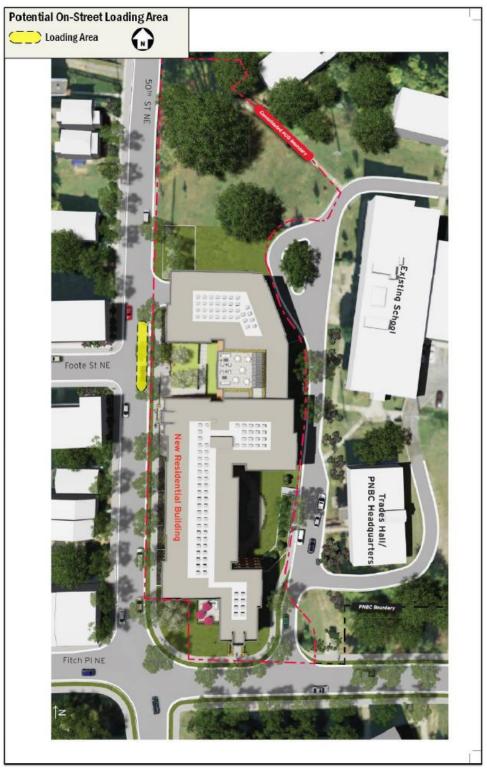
Potential On-Street Loading Areas for Trucks taller than 12'-6" ZC 17-08A EXHIBIT 3F – PROPOSED LOADING AREA
